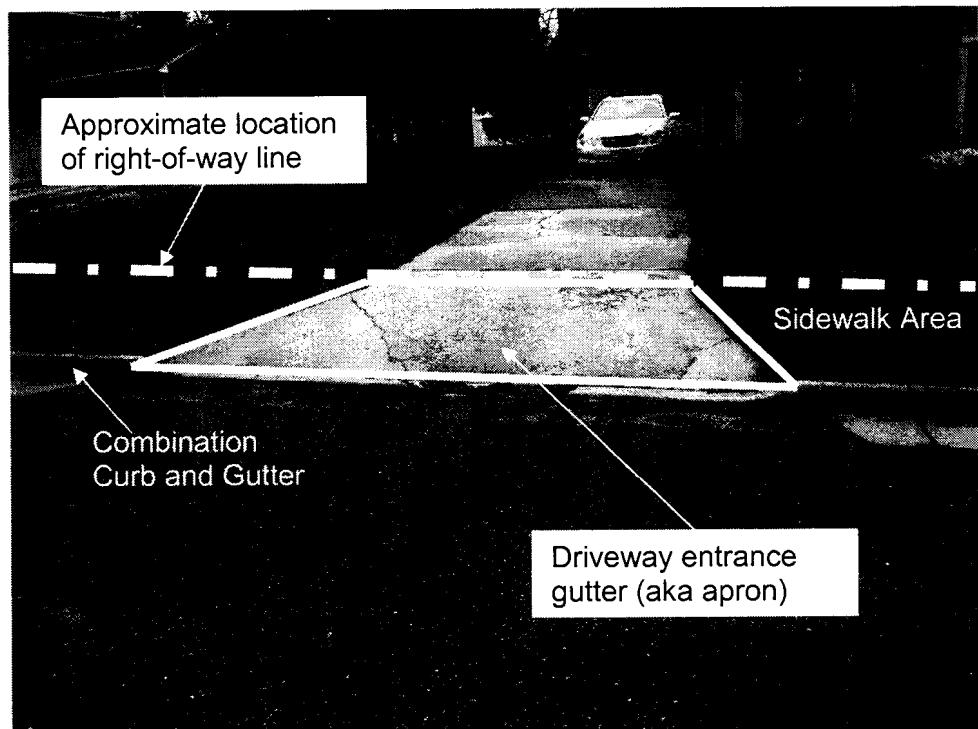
Before reconstruction of private driveway without paved sidewalks
